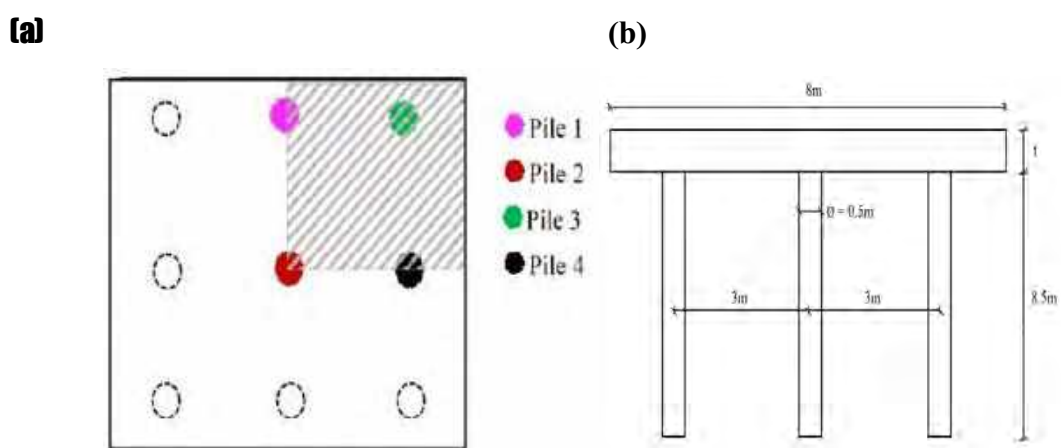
The foundation's geometric arrangement: (a) plan aspect, (b) elevation aspect
